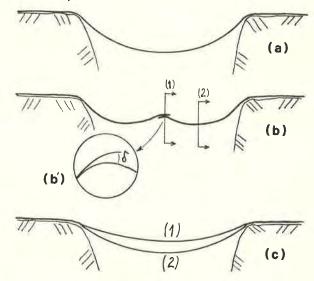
Shape of a geomembrane bridging a depression: (a) cross section of geomembrane without a seam; (b) cross section perpendicular to the seam of a geomembrane with a seam; and (c) cross sections along the seam (1) and parallel to the seam (2) showing less deflection of seam due to double stiffness resulting from double thickness. Double stiffness has only a little direct effect on cross section (b) because it affects only a small portion of this cross section, but the geomembrane shape in cross section (b) is significantly affected by continuous stiffness of the seam in cross section (cl). Such tridimensional effect would not exist if the depression was an infinitely long trough perpendicular to cross section (b).
